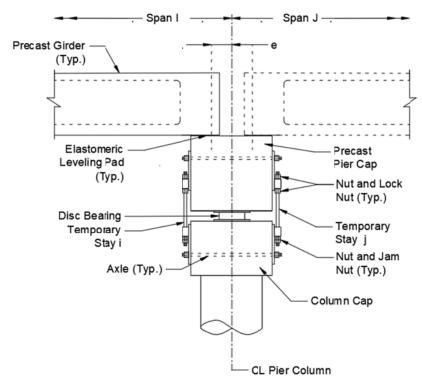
Typical Pier Section (Redrawn from Outcal et al. 2014).
